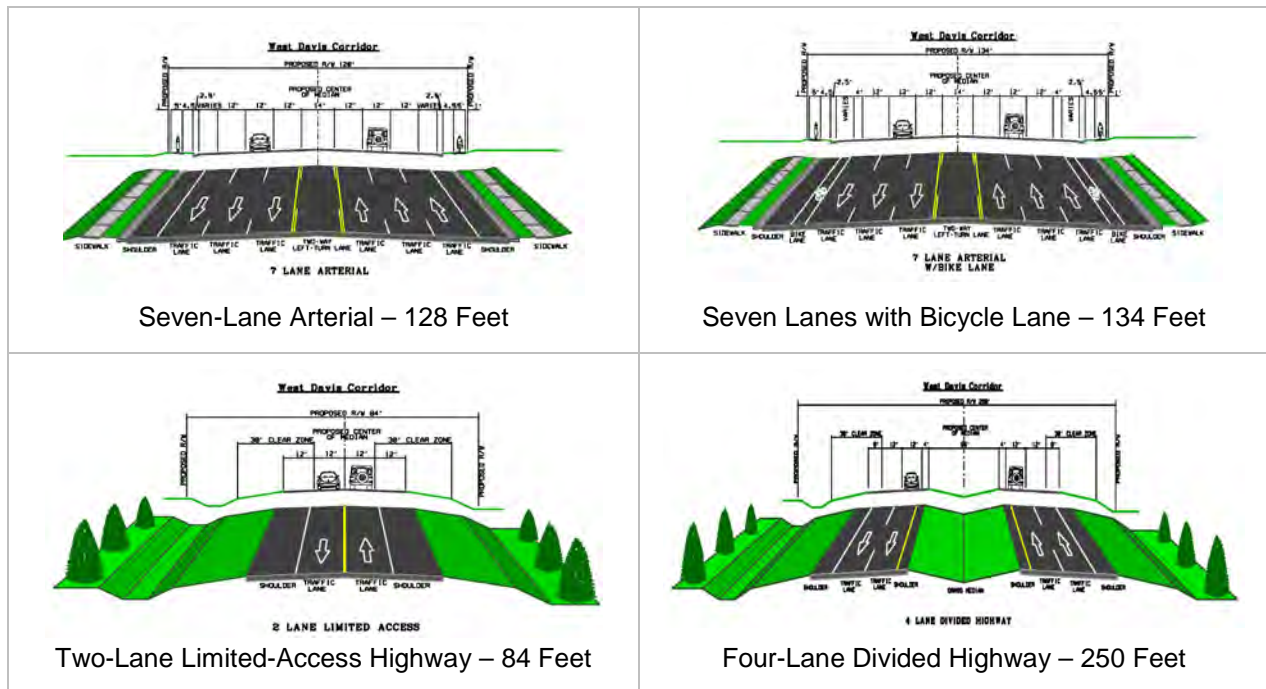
below shows the right-of-way widths and typical sections that will be used for Level 2 screening.
